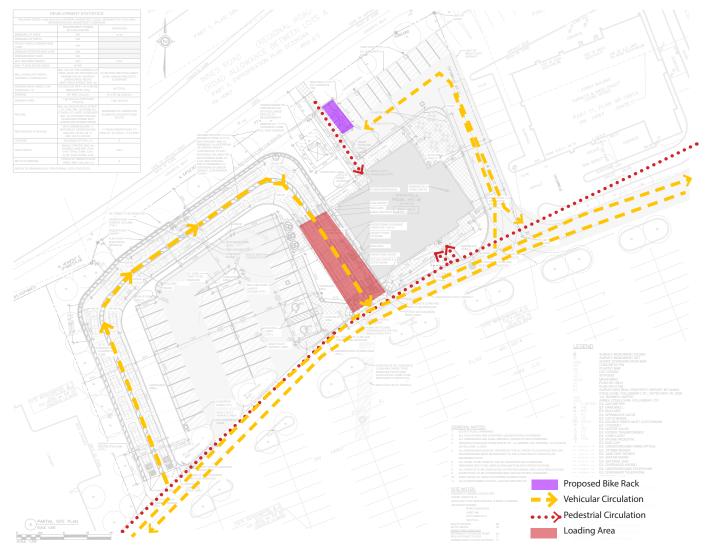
Proposed Site Plan of site overlaid with car and pedestrian circulation.
